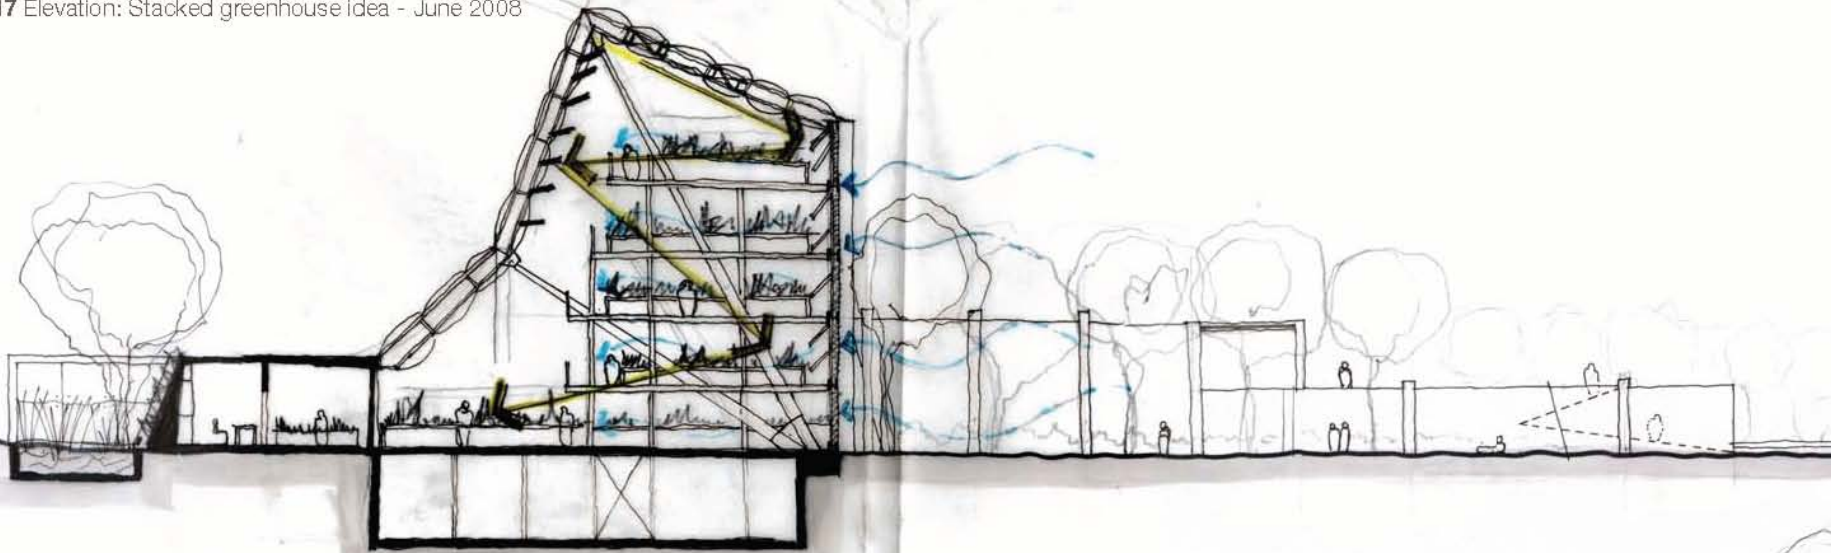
Section: Stacked greenhouse idea - June 2008
